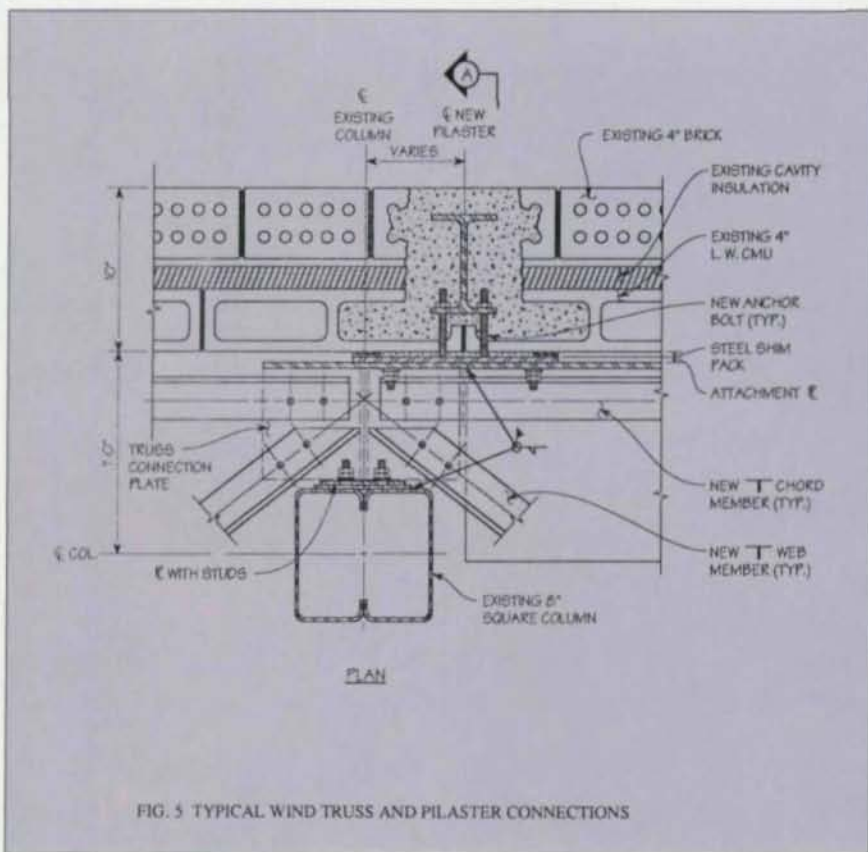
TYPICAL WIND TRUSS AND PILASTER CONNECTIONS
